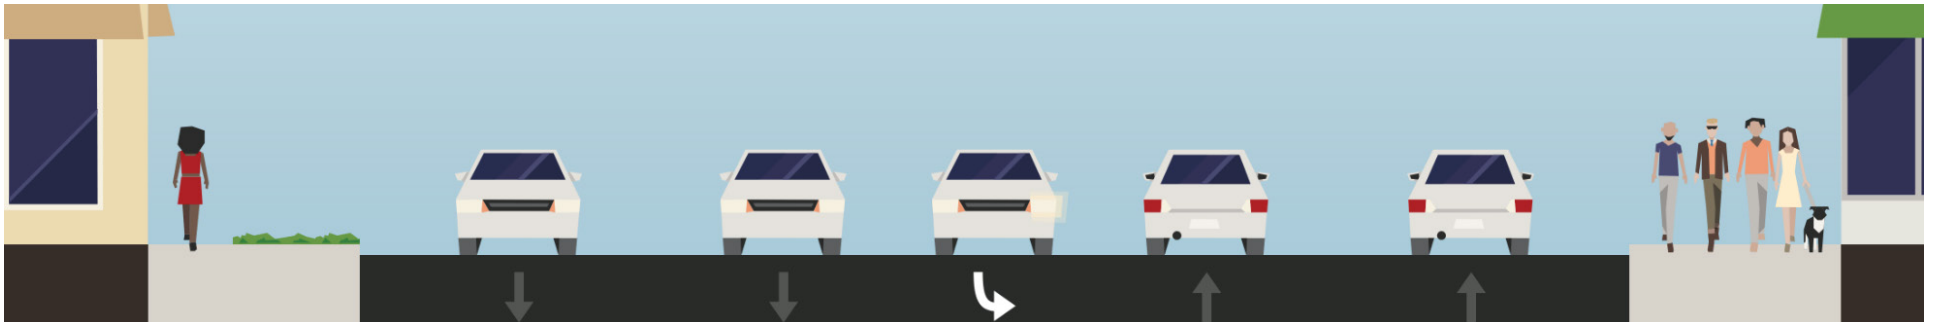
Existing cross-section: Marine Ave from west of Prairie Ave to west of Gerkin Ave
